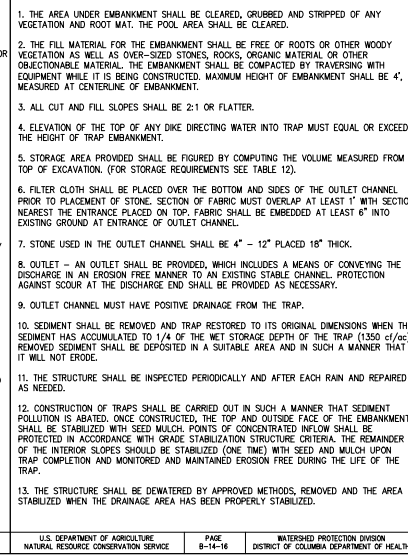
RIP-RAP OUTLET SEDIMENT TRAP - ST III
